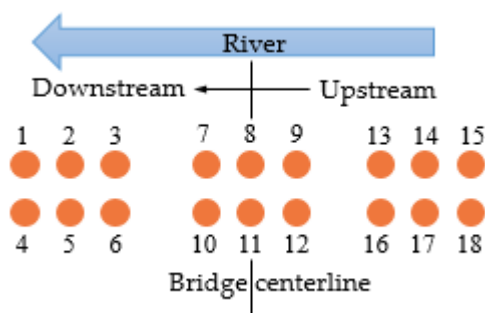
Location and number of steel pipe columns of the tower at the right bank.
